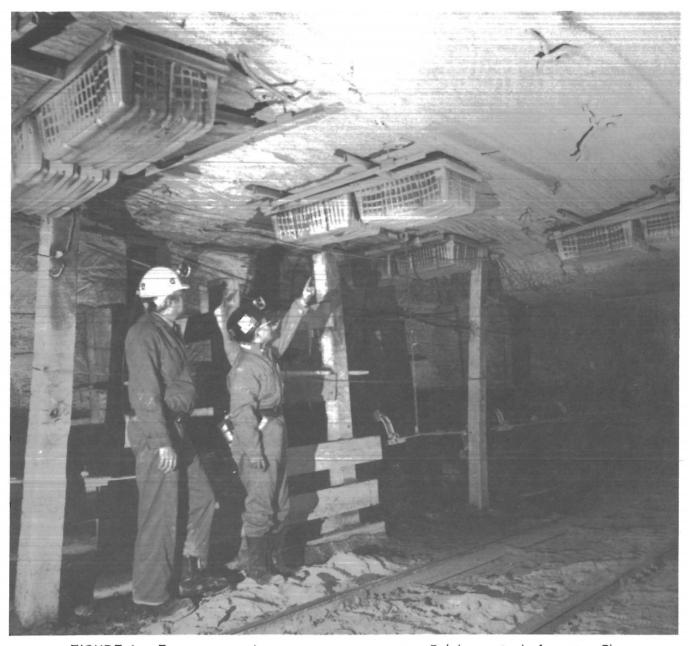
Passive water barriers as seen in section B (also typical of section C).
